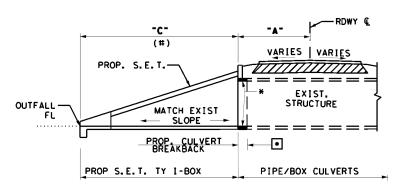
DETAIL FOR CROSSING BOX CULVERT(S) WITH CUTBACK
